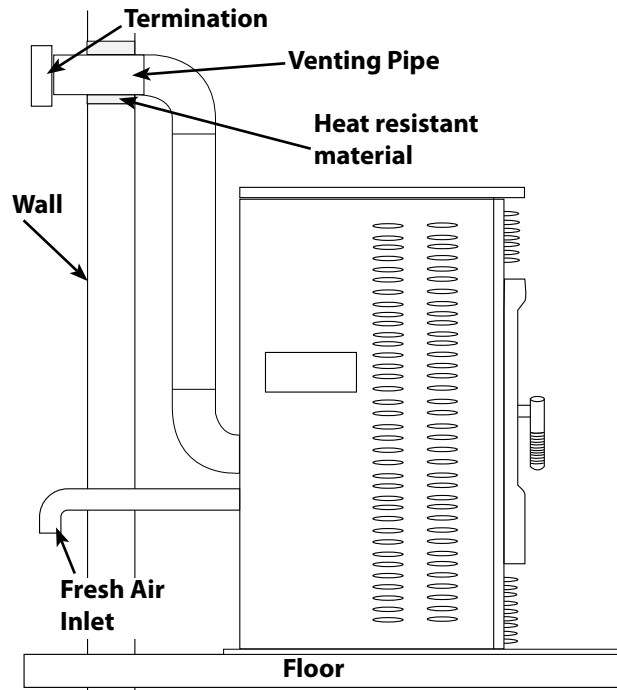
Straight Installation—inside vertical rise, horizontal termination
